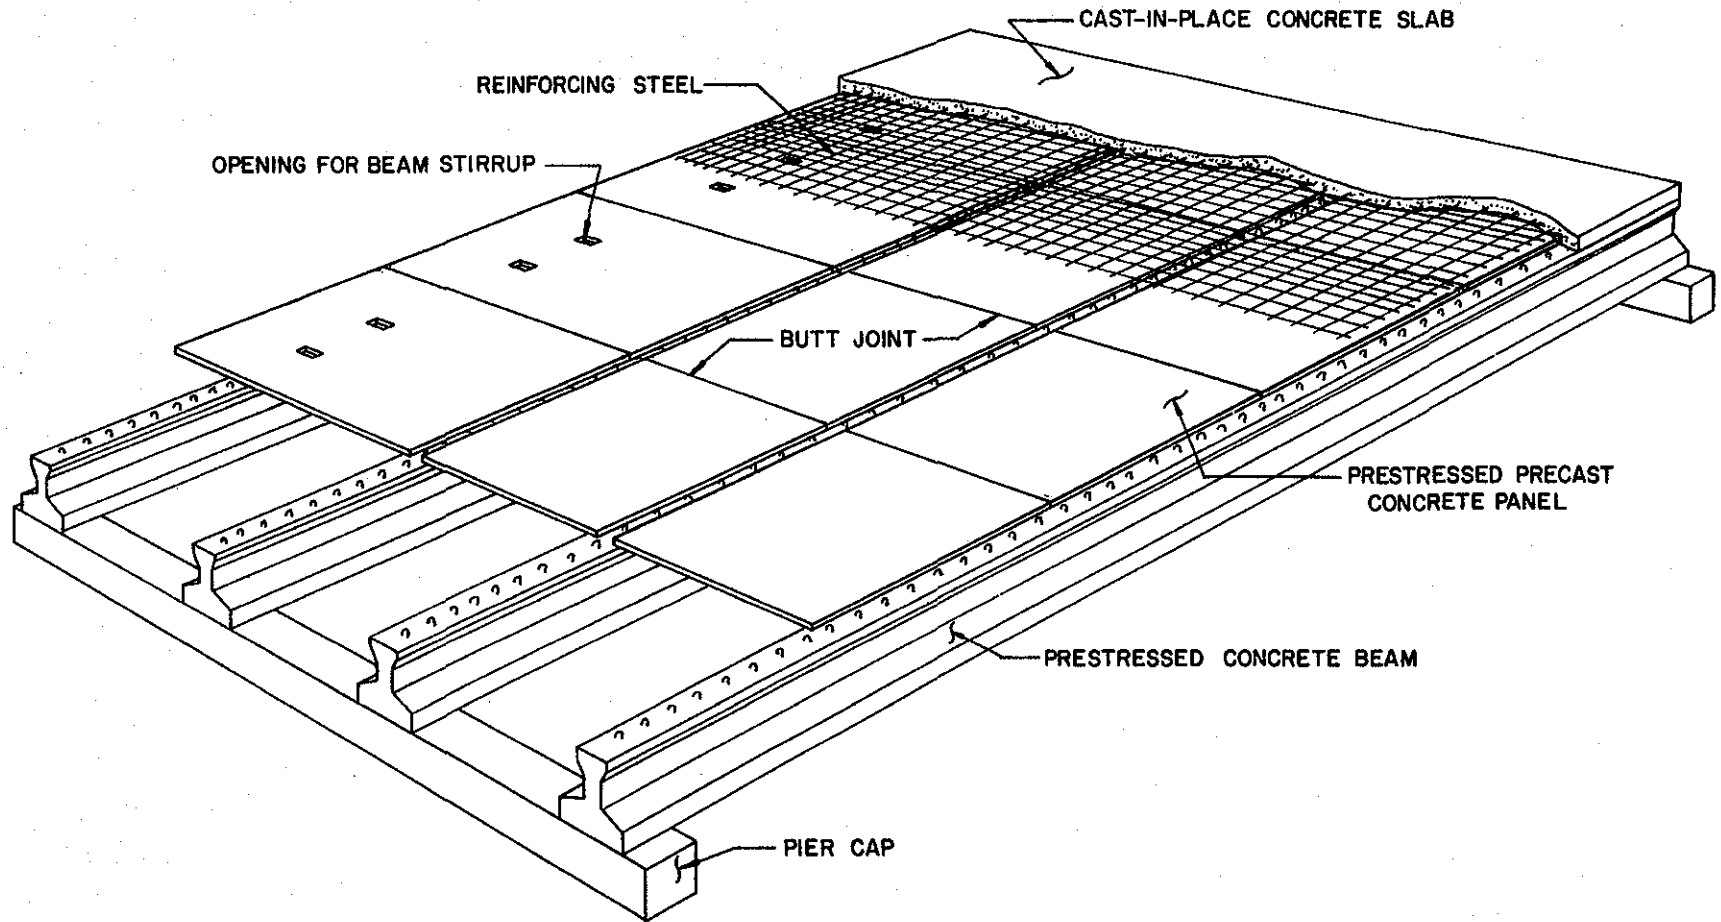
Cut-away View of Prestressed Panel Type Bridge.
